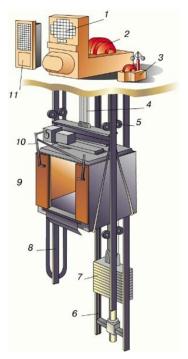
Elevator design with electromechanical drive: 1 — electric motor; 2 — winch; 3 — speed limiter; 4 — traction ropes; 5 — guide rollers of the cabin; 6 — counterweight guides; 7 — counterweight; 8 — cab guides; 9 — cabin; 10 — door mechanism; 11 — control panel
